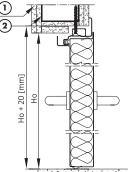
Installation of a double-leaf door with a corner frame to a masonry wall -vertical cross-section
